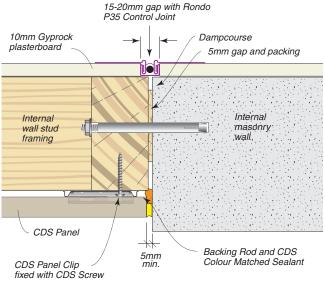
Typical Junction of CDS with Masonry Wall – Plan View
